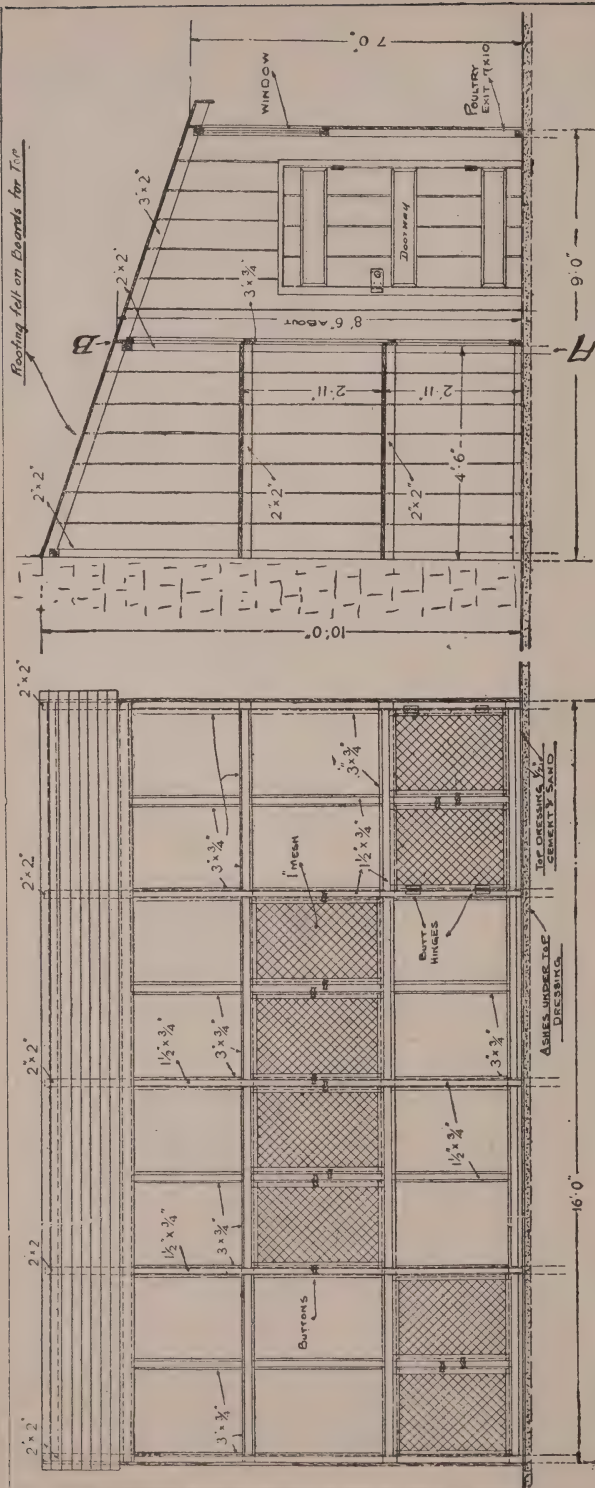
Front Elevation and Vertical Section of Three-tier Intensive Poultry House
